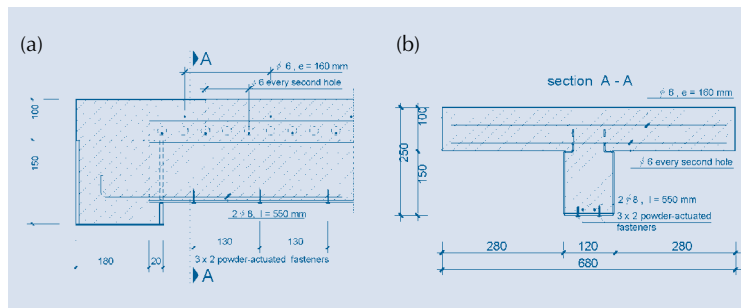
Simply supported T-beam for ultimate load test: (a) longitudinal section with support details, (b) cross section
